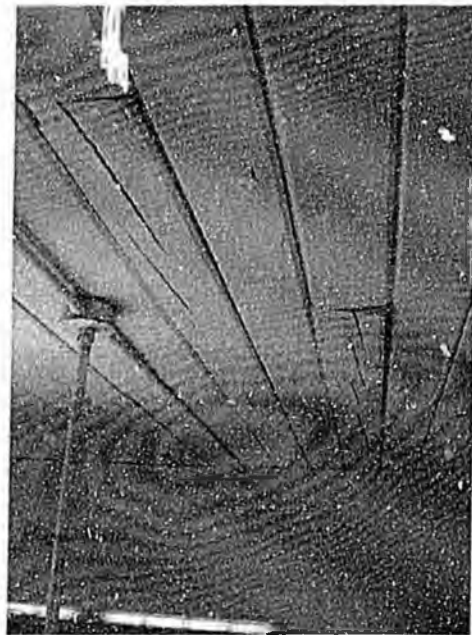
View showing another location where distress of roof decking is evident. A combination of high load and shrinkage appears to have dislodged the tongue-and-groove splines with resultant loss of strength.
